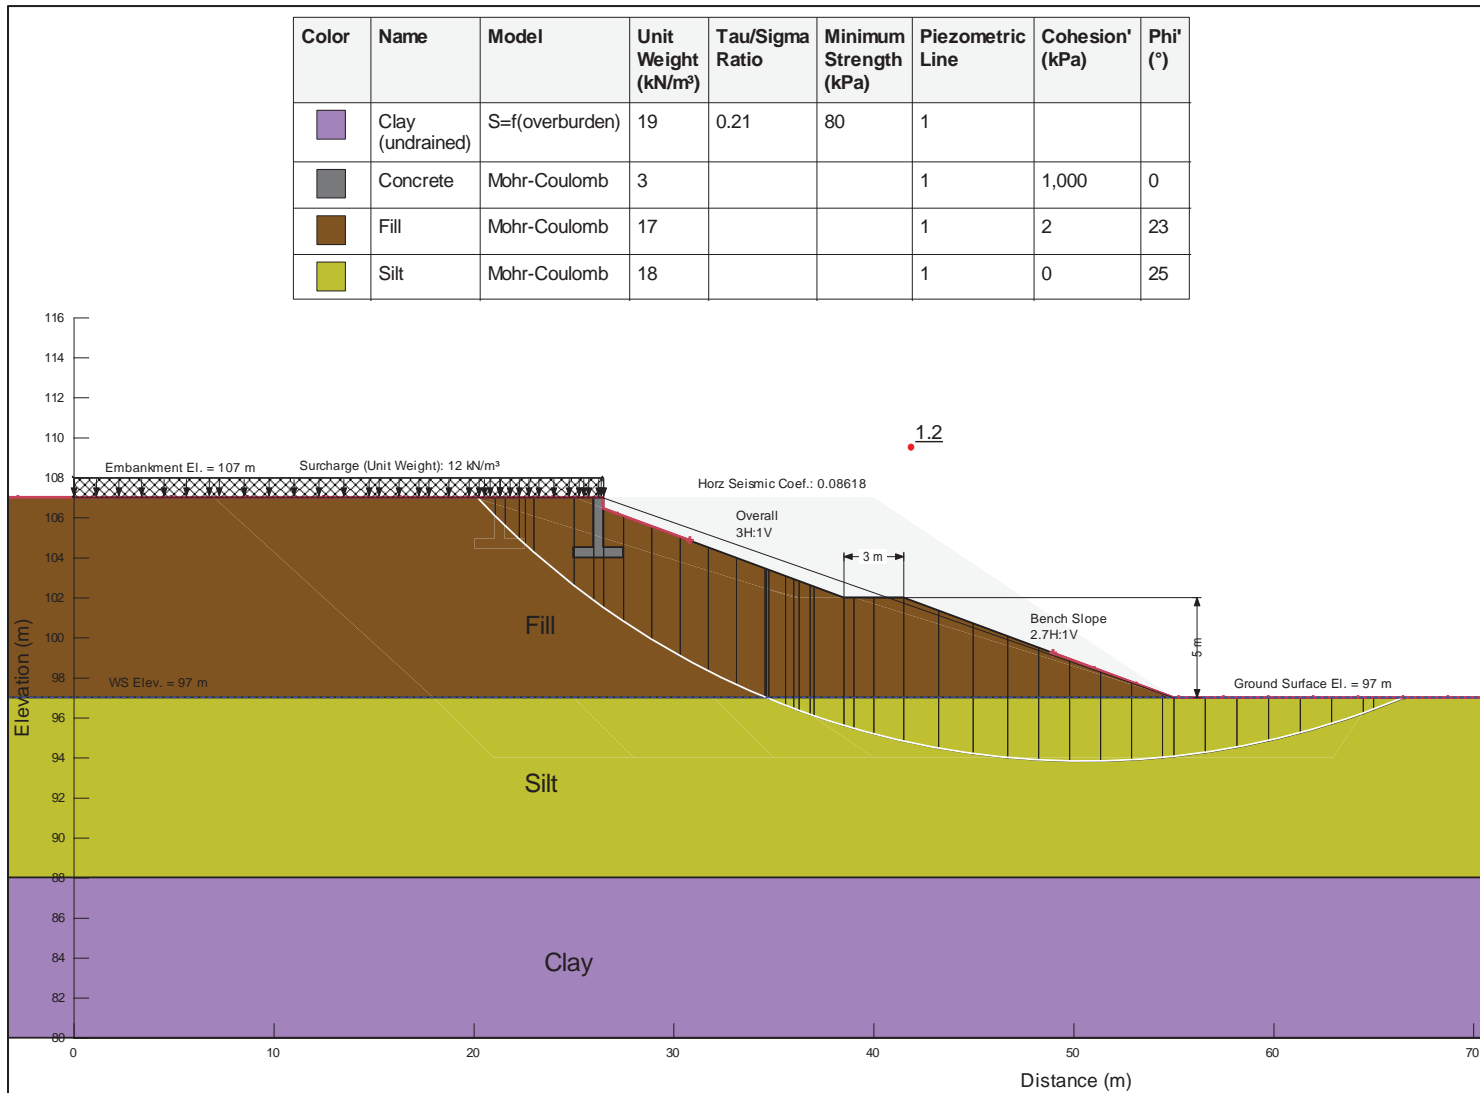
Jane St. North Embankment Pseudo-Static (Undrained) Case B2
